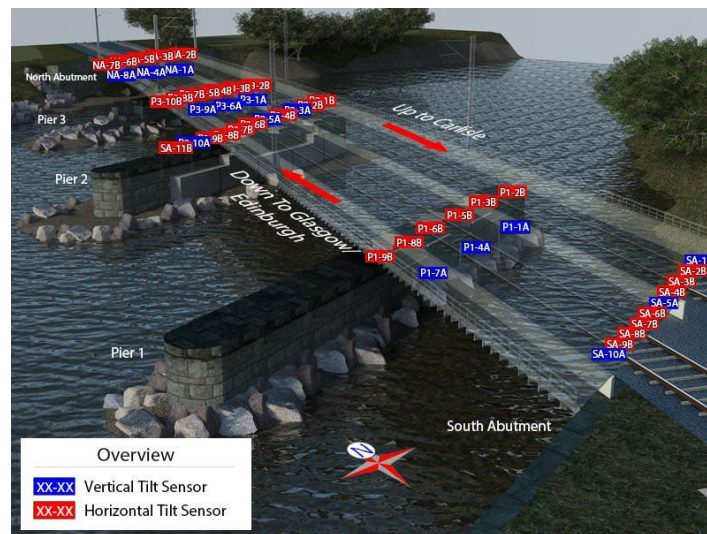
Layout of the SHM system installed at the Lamington viaduct (courtesy of Network Rail).
